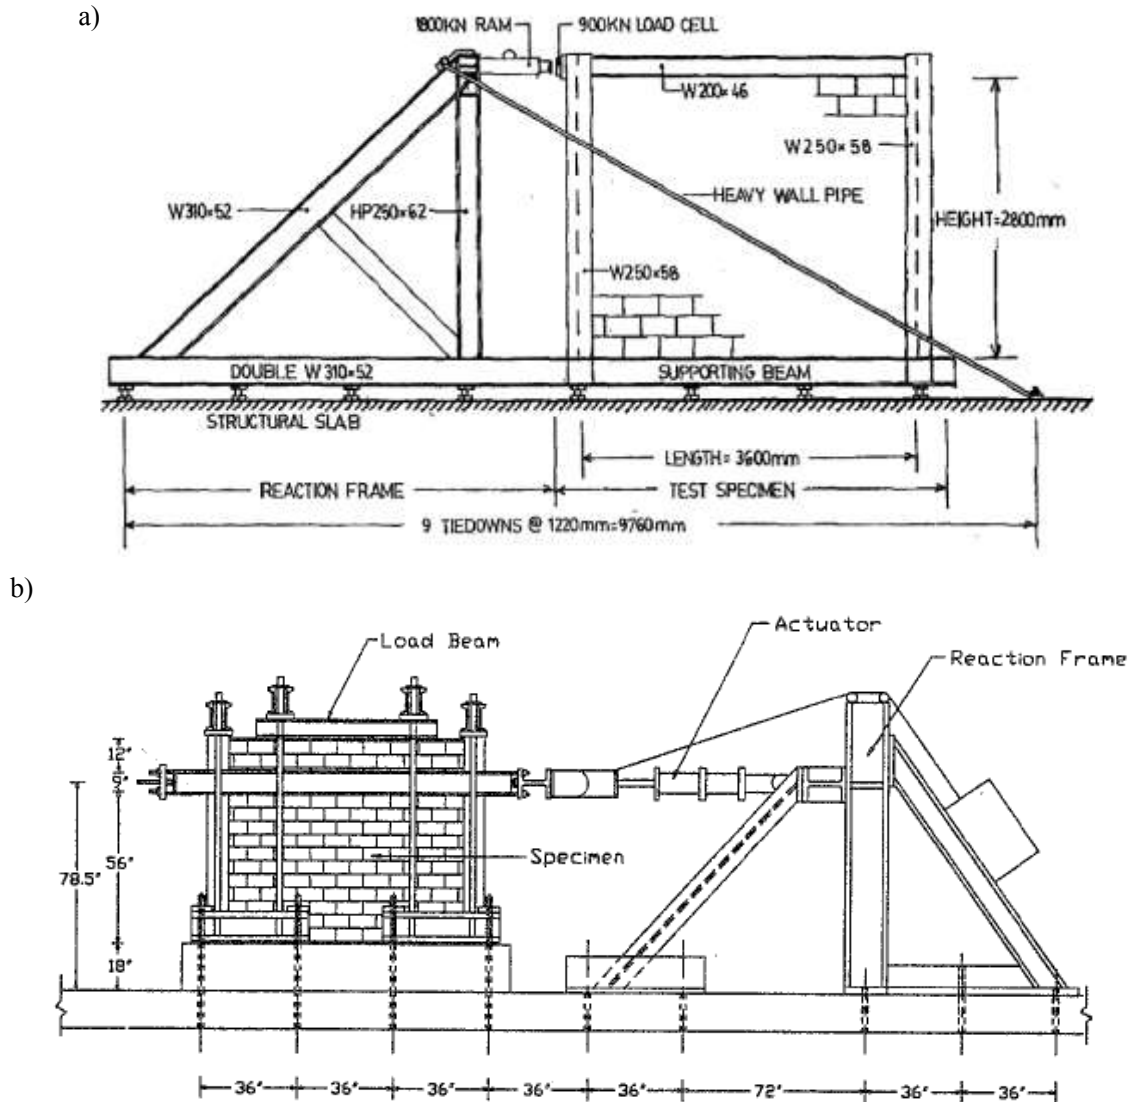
Typical test setup used in the experimental studies: (a) steel frames (McBride, 1984); (b) RC frames (Mehrabi & Shing, 1996)
